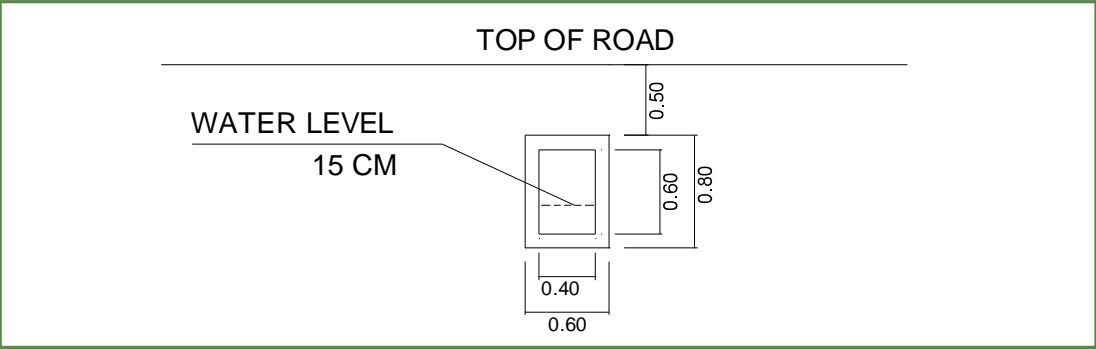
DETAIL OF BOX CULVERT - 2 (MENTENG AREA 2)
